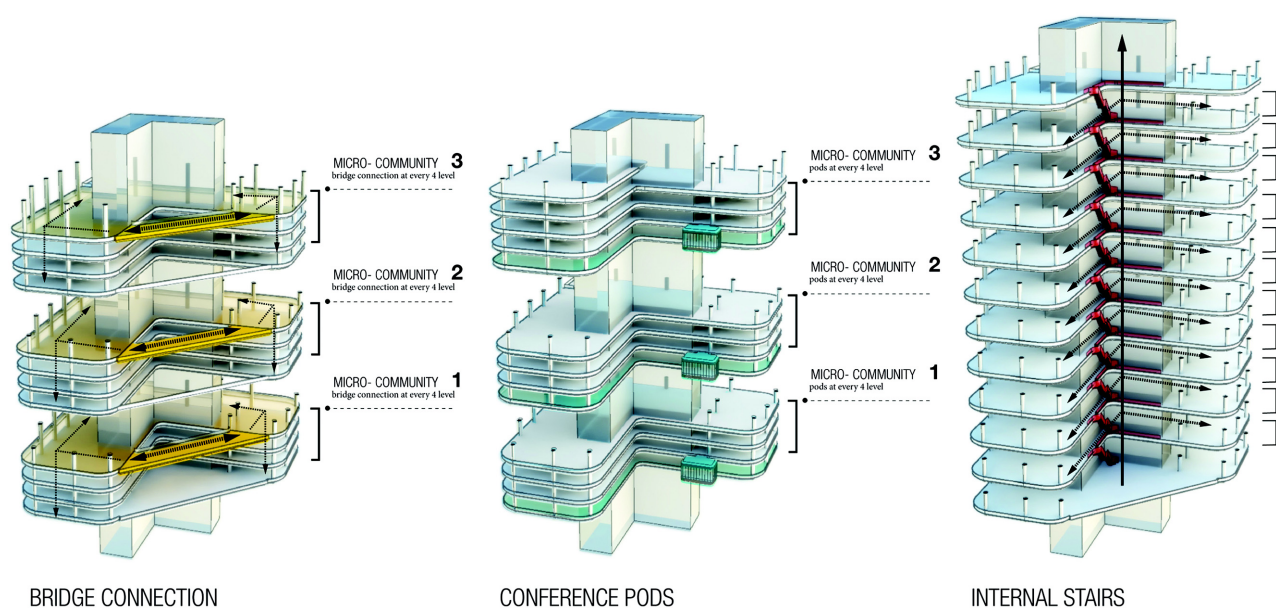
Diagram illustrating subdivision by bridge connections, conference pods, and internal stair connections. (Source: Woods Bagot).
